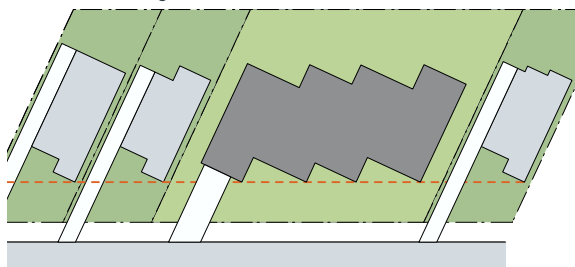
G.3 Streetscapes are defined by a combination of public elements (carriageways, kerbs, verges and footpaths) and private elements (street setbacks, fences and building facades)
